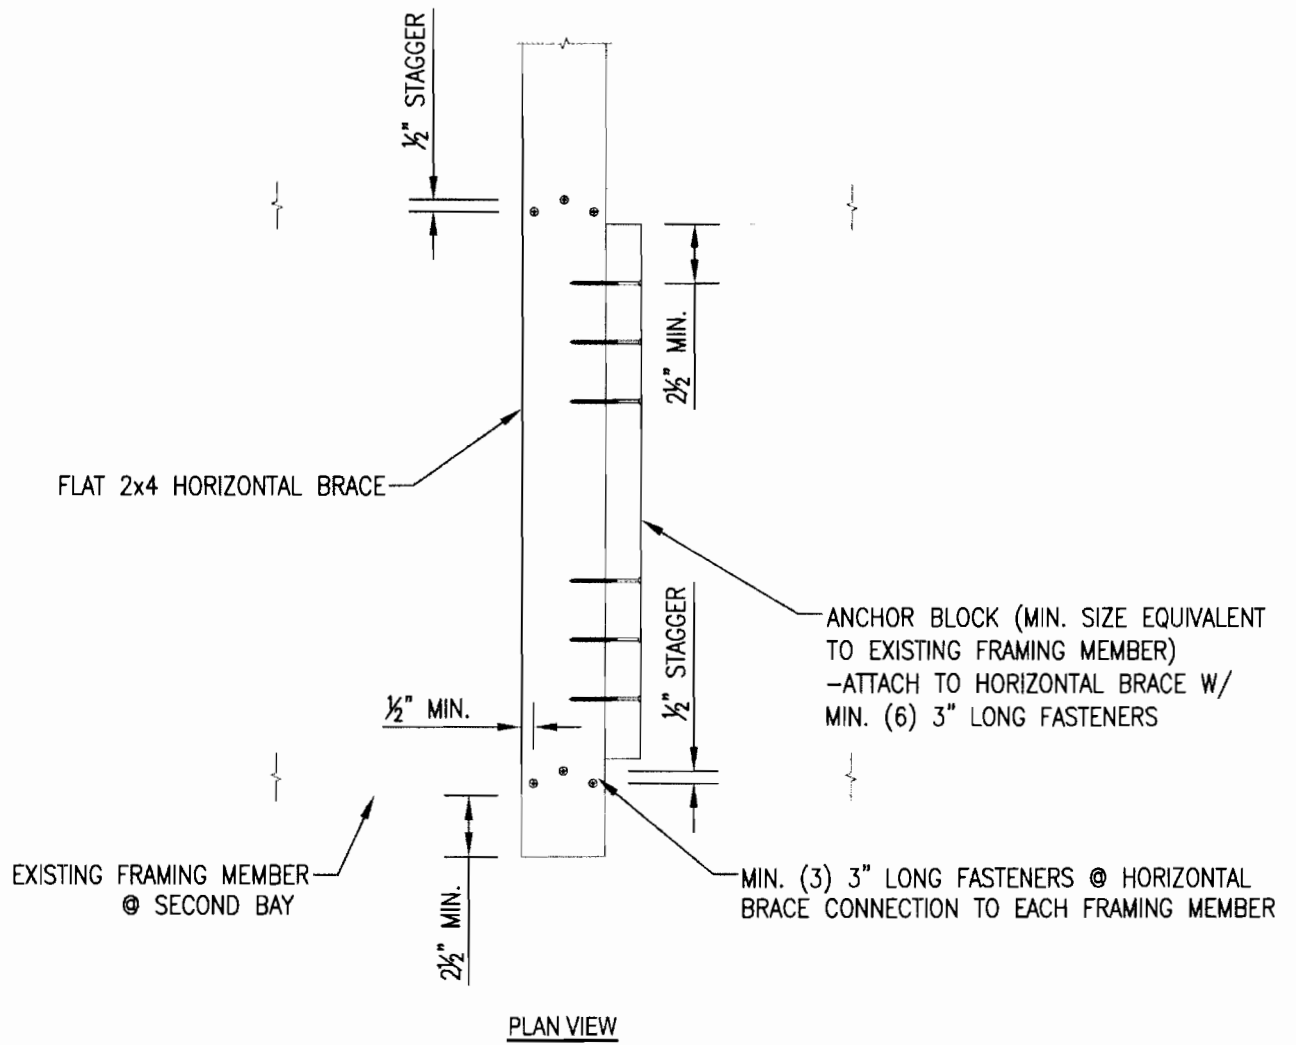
DETAIL OF ANCHOR BLOCK INSTALLATION
